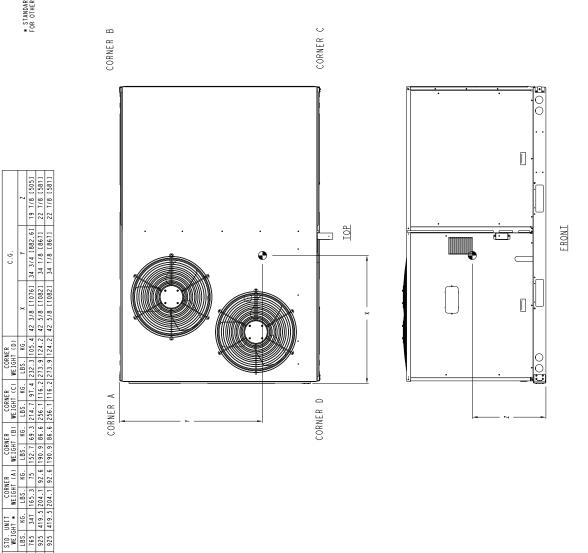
Unit Dimensional Drawing — Sizes 072-102 (cont)
